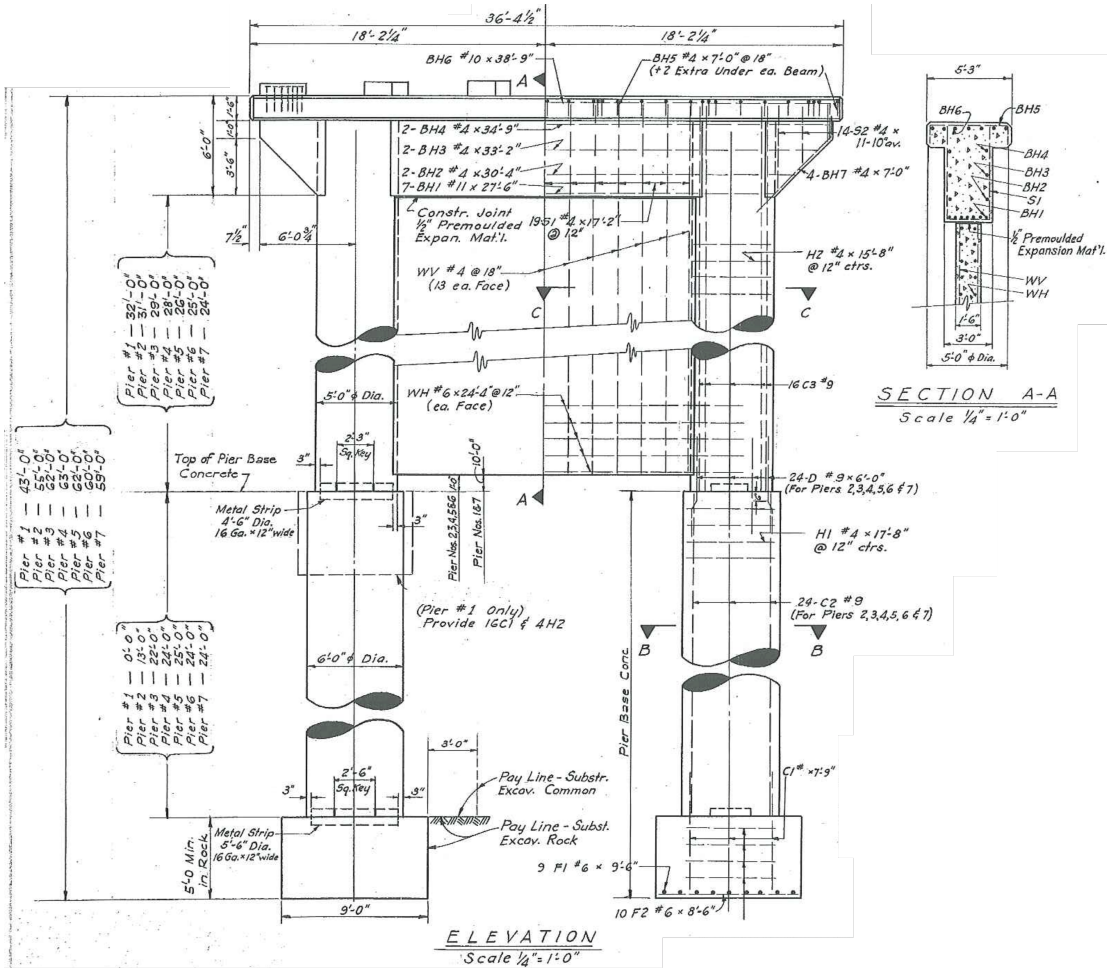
Pier details. Taken from Proj. No. I-456-(16) plans.
